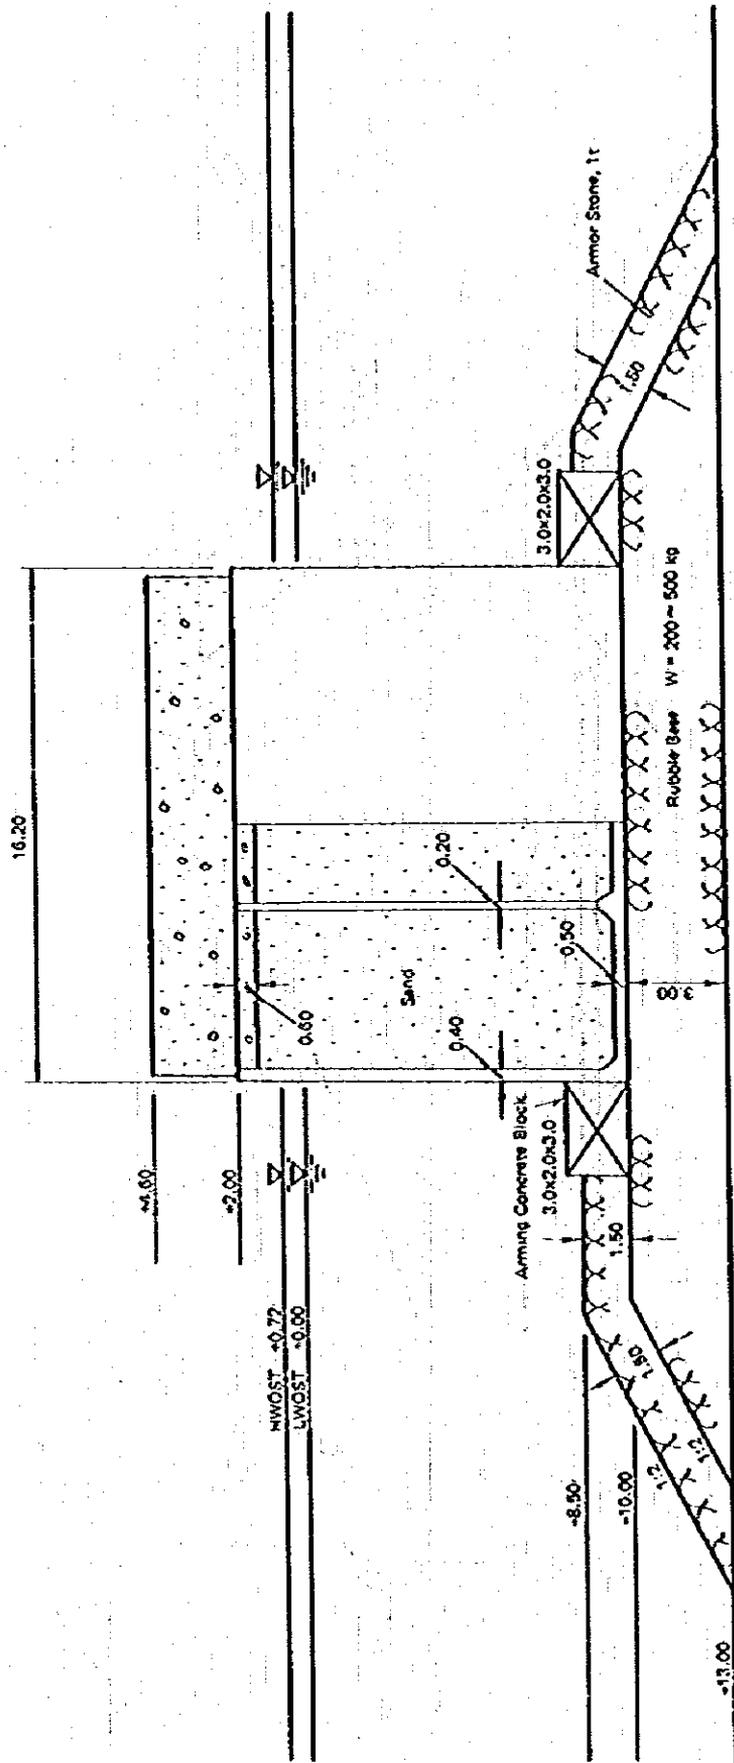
Typical Cross-section of Breakwater (-13m)
